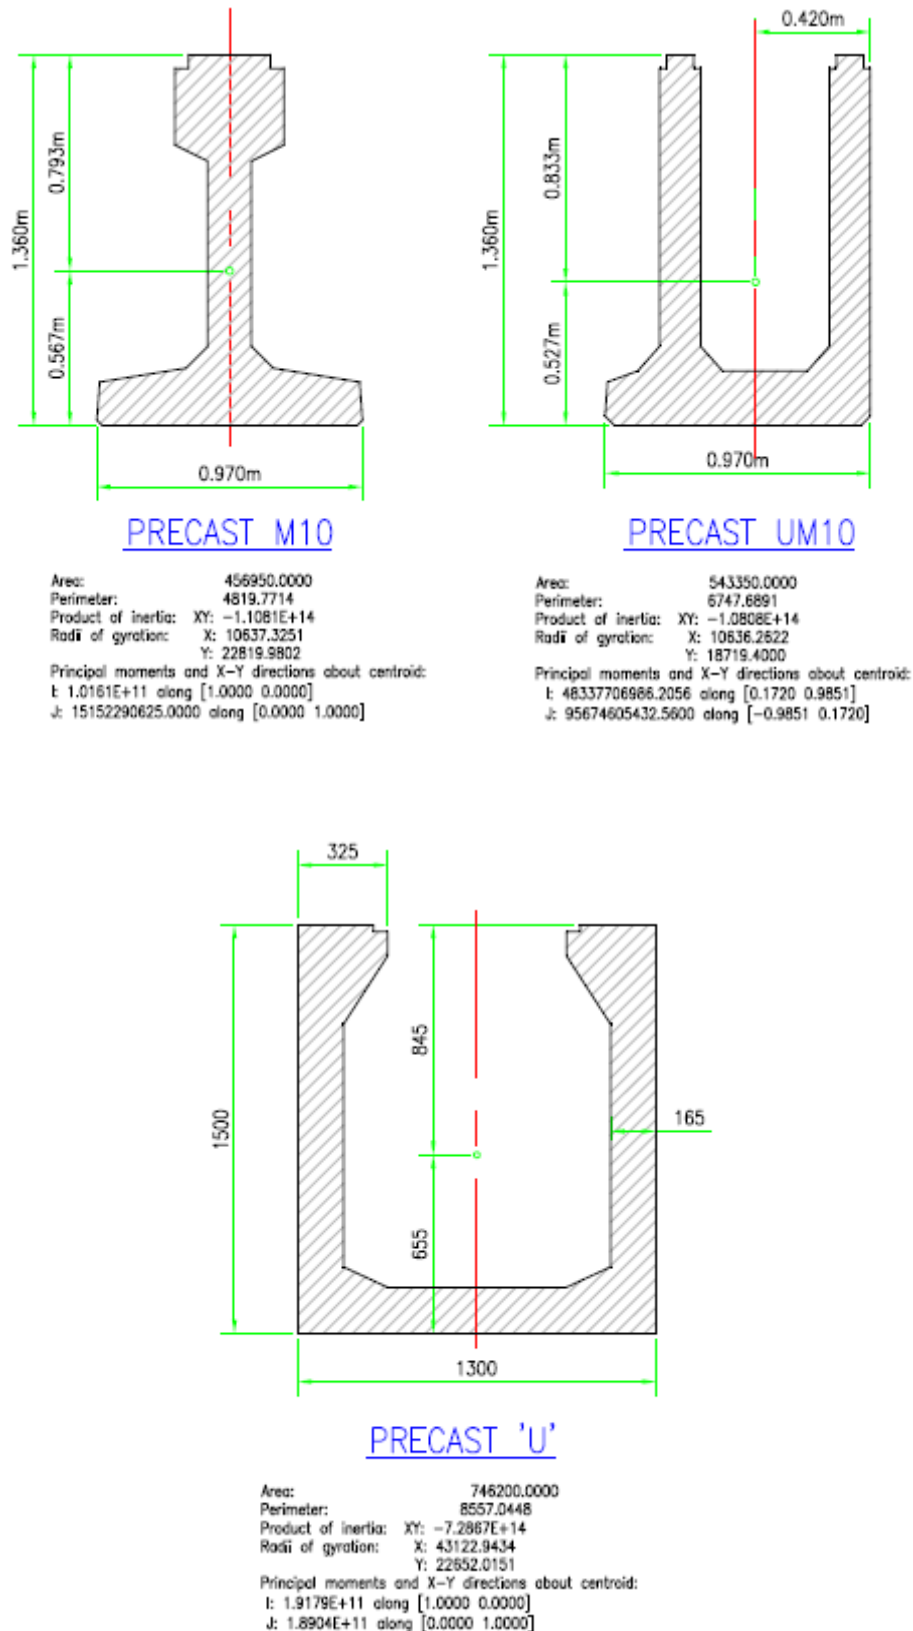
Pier P-25 (Type P1-A) precast beam section properties
